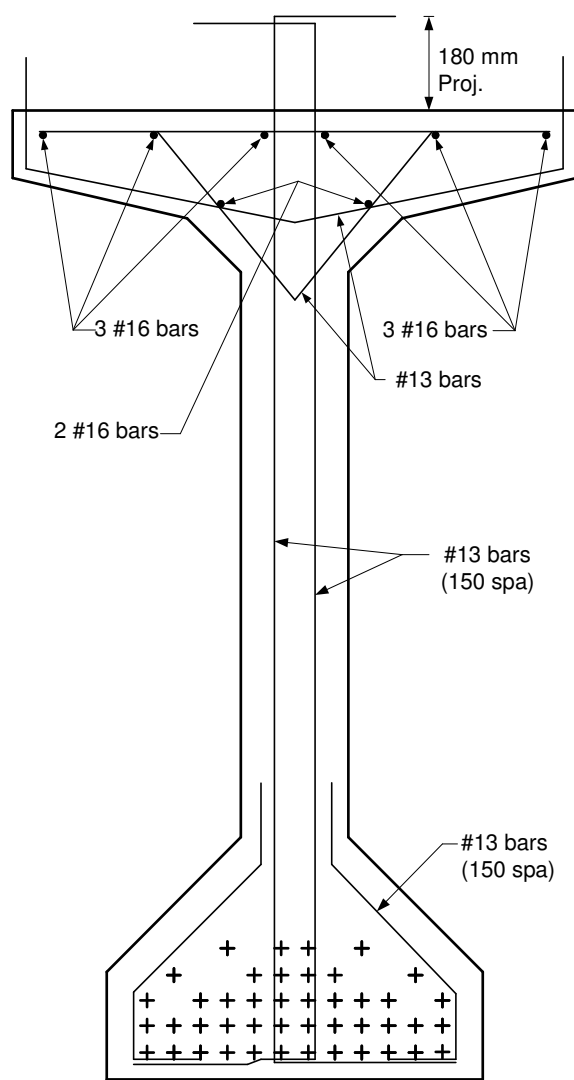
Section A-A from Figure 5.7-1, Beam Cross Section Near the Girder Ends
